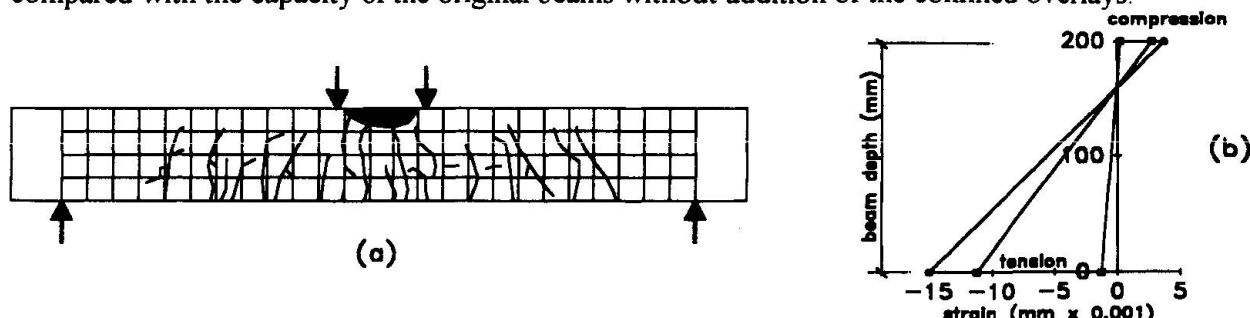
Behavior of beam Type S3. a- Crack pattern. b- Strain diagram.
